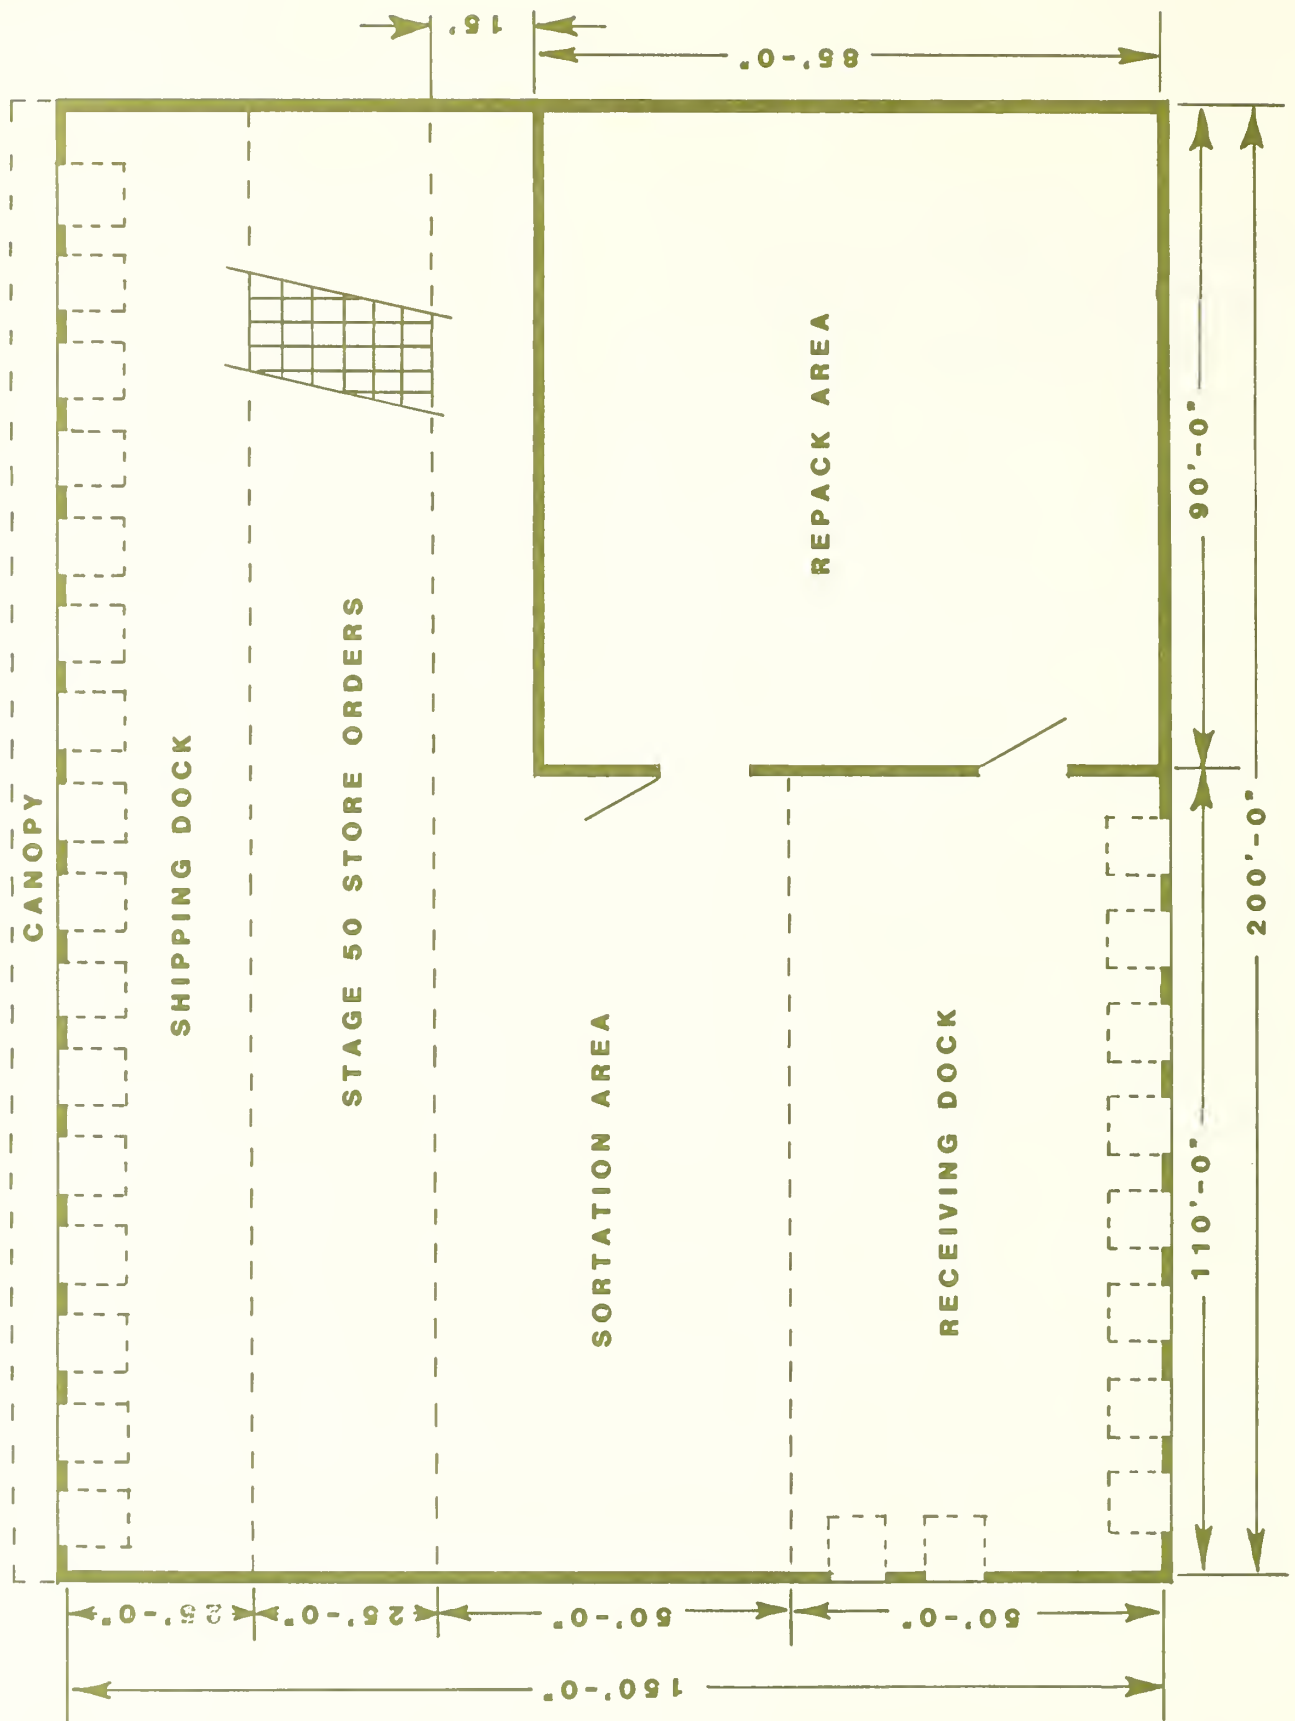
Schematic layout of a proposed consolidation warehouse.
